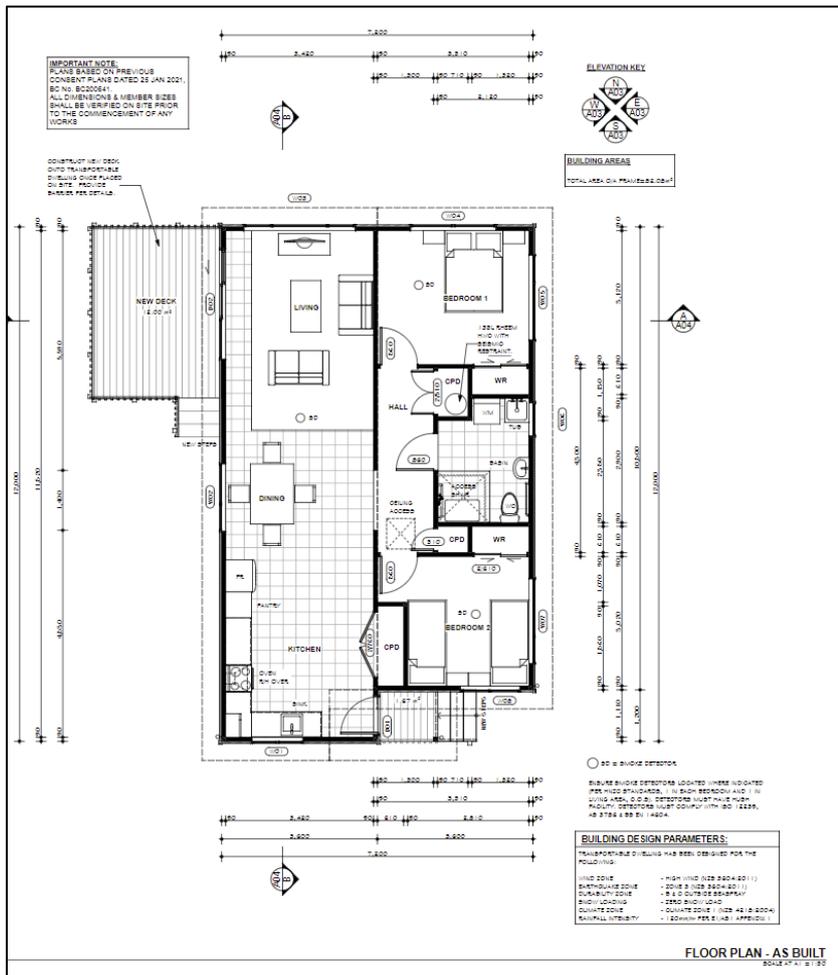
Proposed Floor Plan (2-bedroom dwelling)
